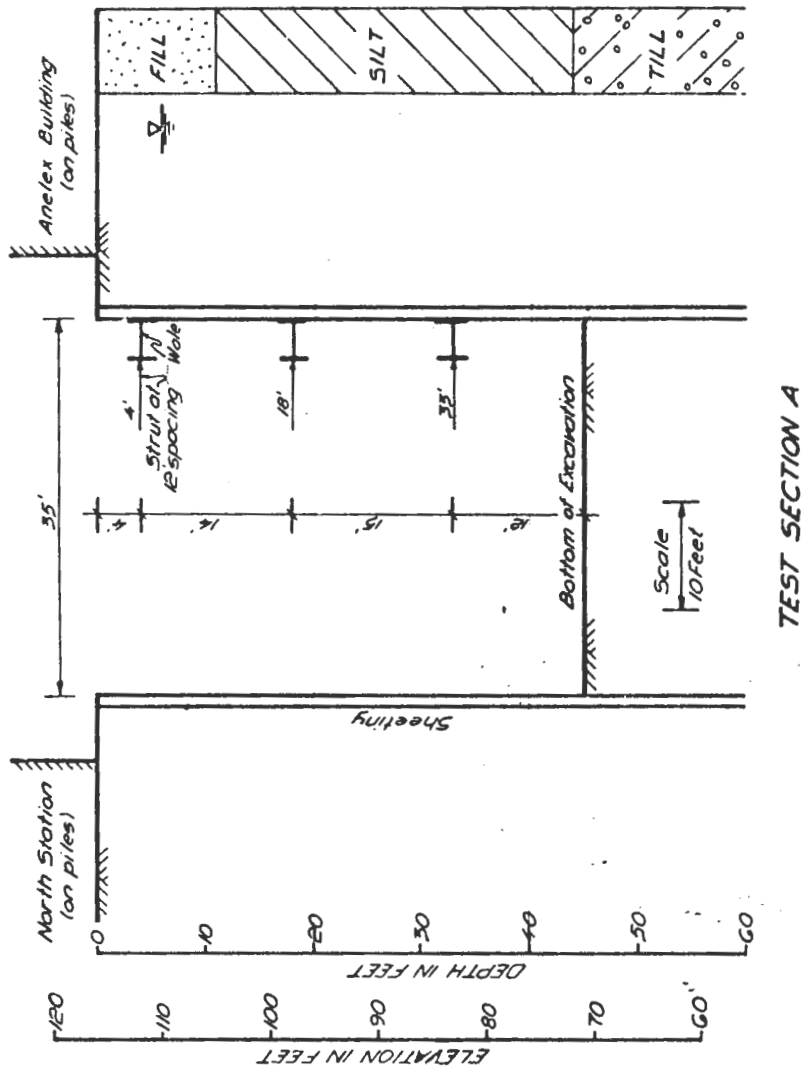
CROSS SECTION AT TEST SECTION A
